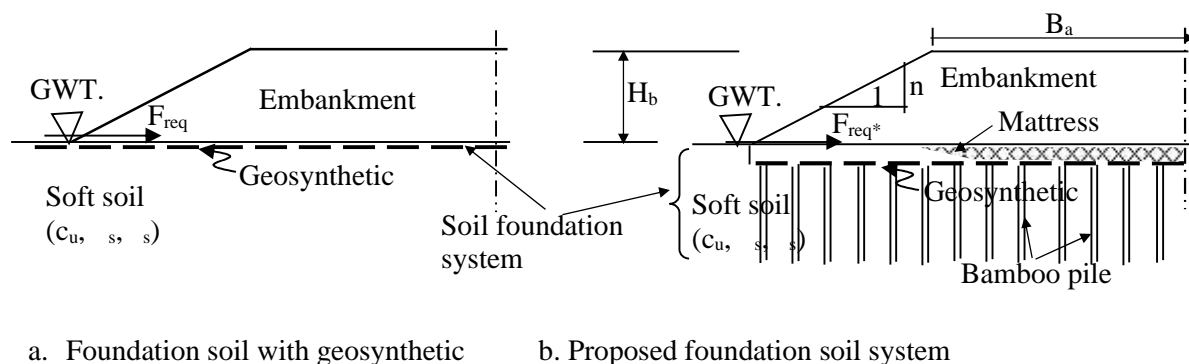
Required force on reinforcement of soil foundation system using bamboo pile
